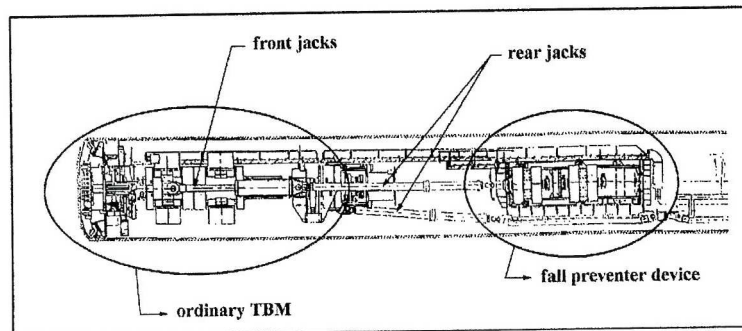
Typical configuration of open TBMs equipped for up-hill excavation.
